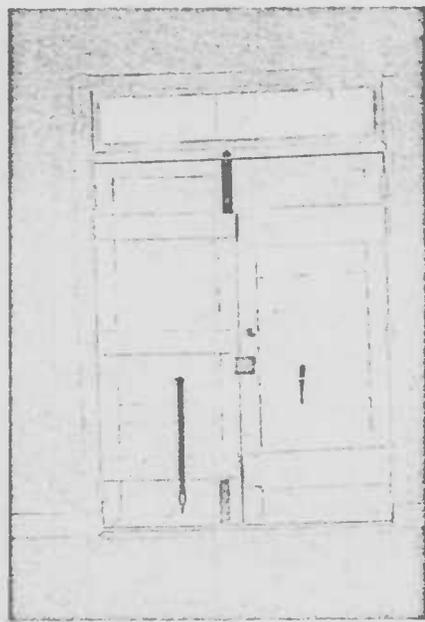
INTERIOR OF MAIN ENTRY DOORS.
